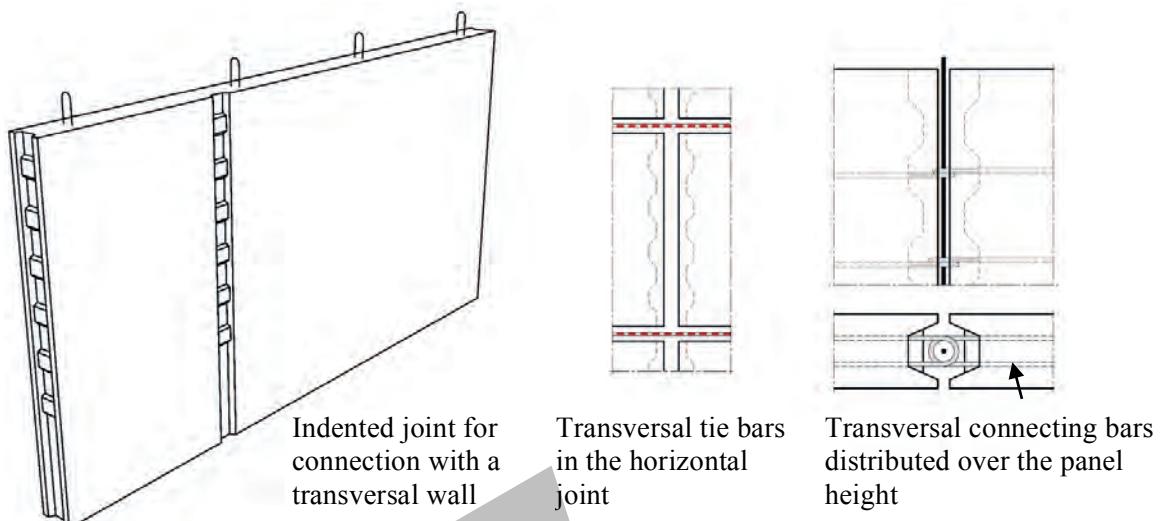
Vertical joints between wall elements; a. indented wall joints, b. connecting reinforcement concentrated in the horizontal joints, c. connecting reinforcement distributed over the panel height
